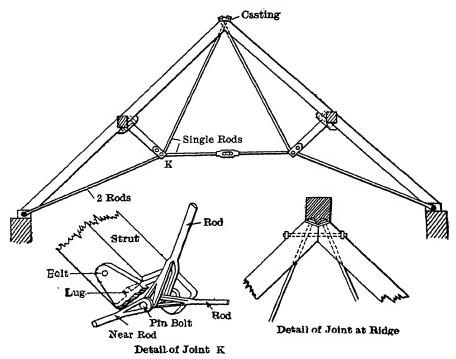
A Wooden Truss with Iron Ties. Spans up to Thirty-six Feet
